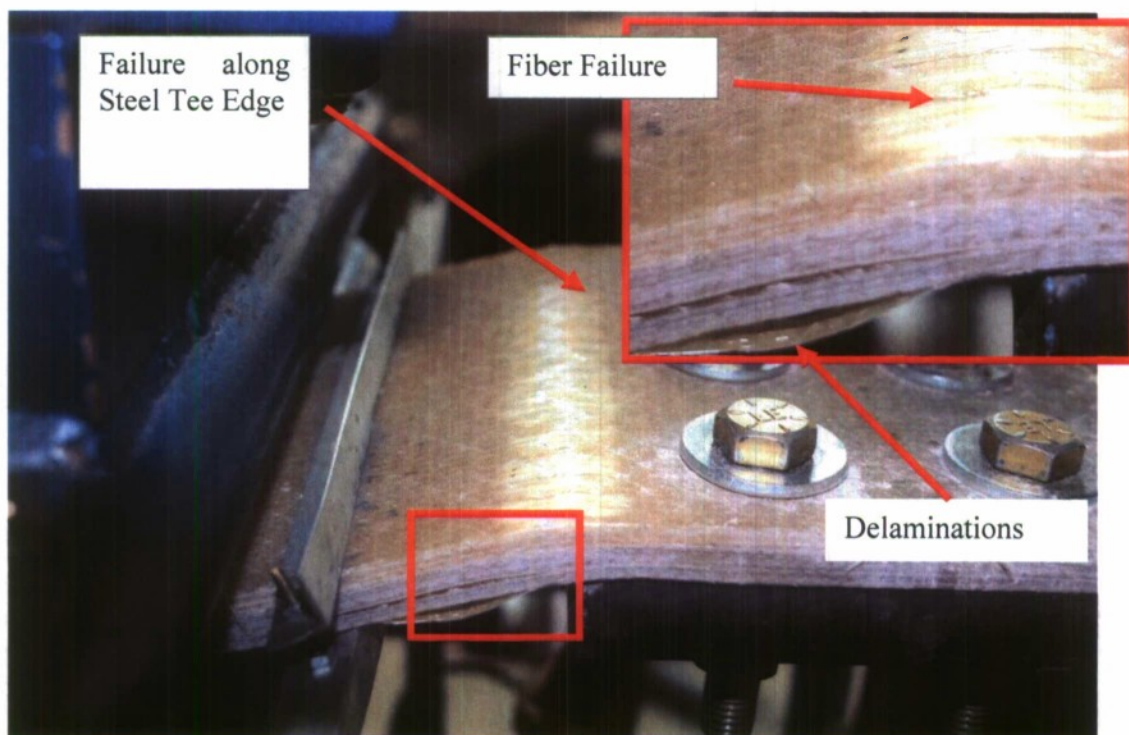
28-Ply Bolted Joint Cyclic Test Close-Up Failure Photo
